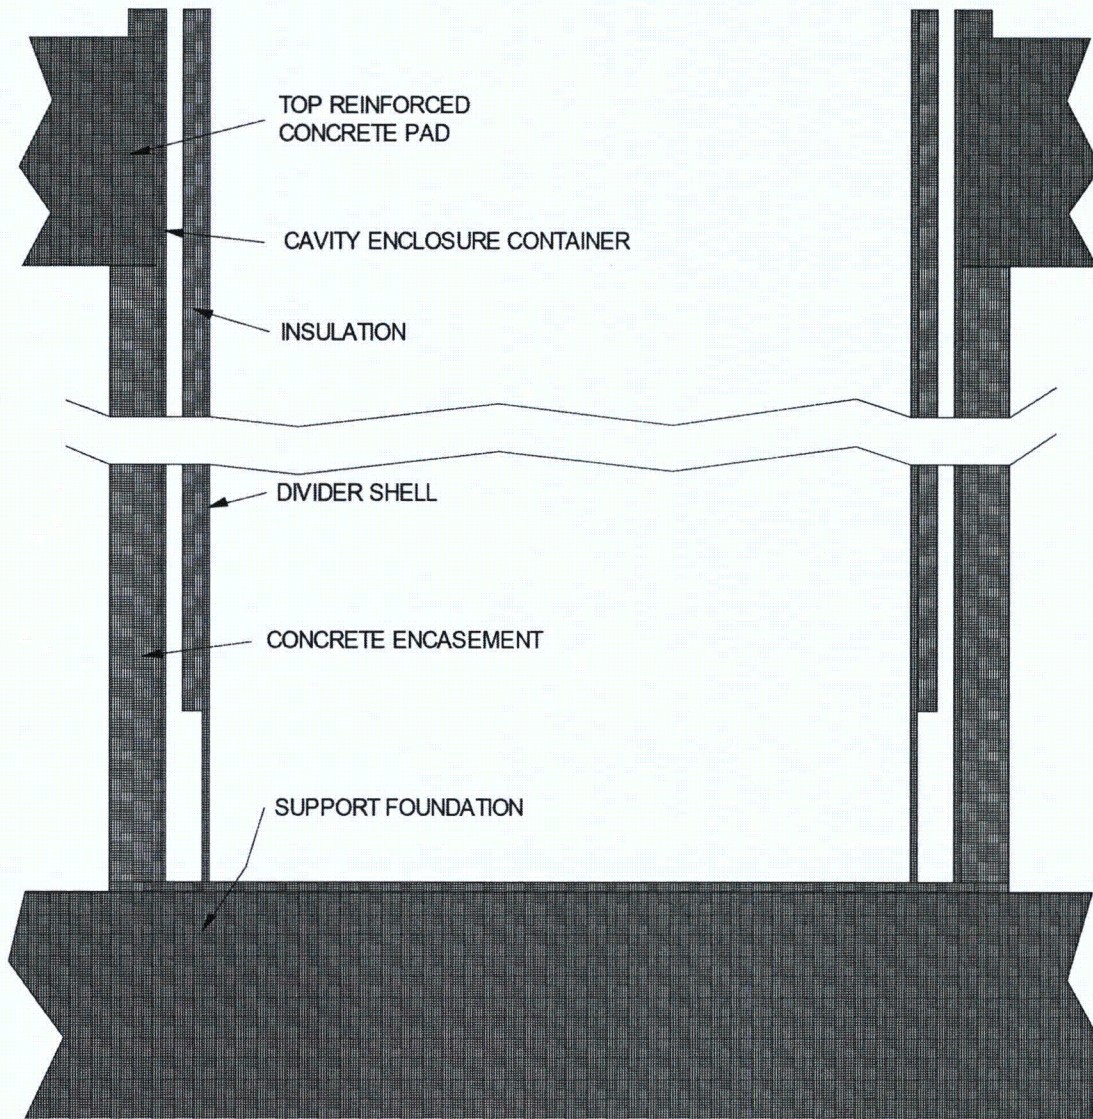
I.3: TYPICAL CONCRETE ENCASEMENT OF THE CEC
